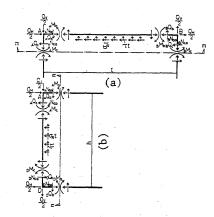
Equilibrium of Forces Acting on the Sections (a) for Beam (b) for Column of Surrounding Frame
